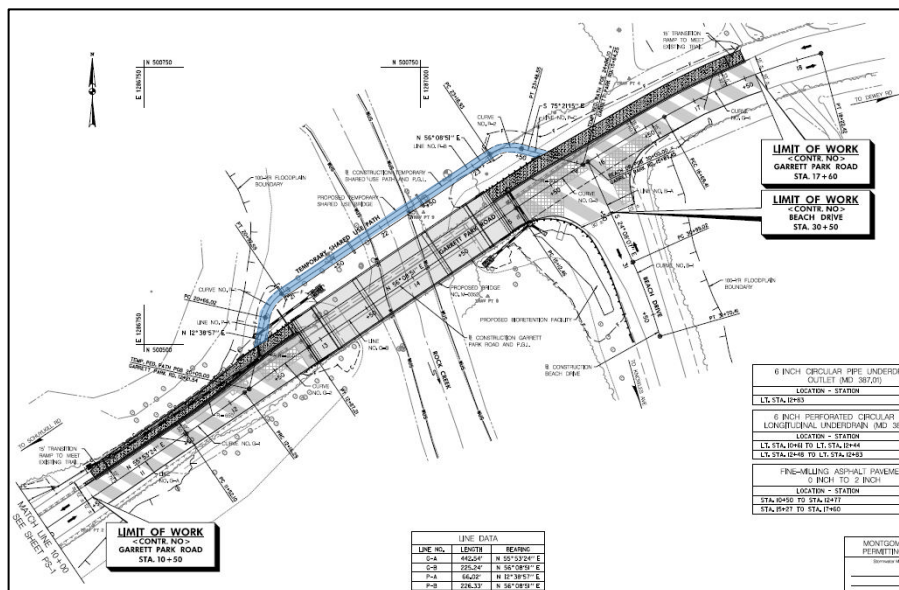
Proposed Temporary Pedestrian/Bicycle Bridge and Sidepath Connections
